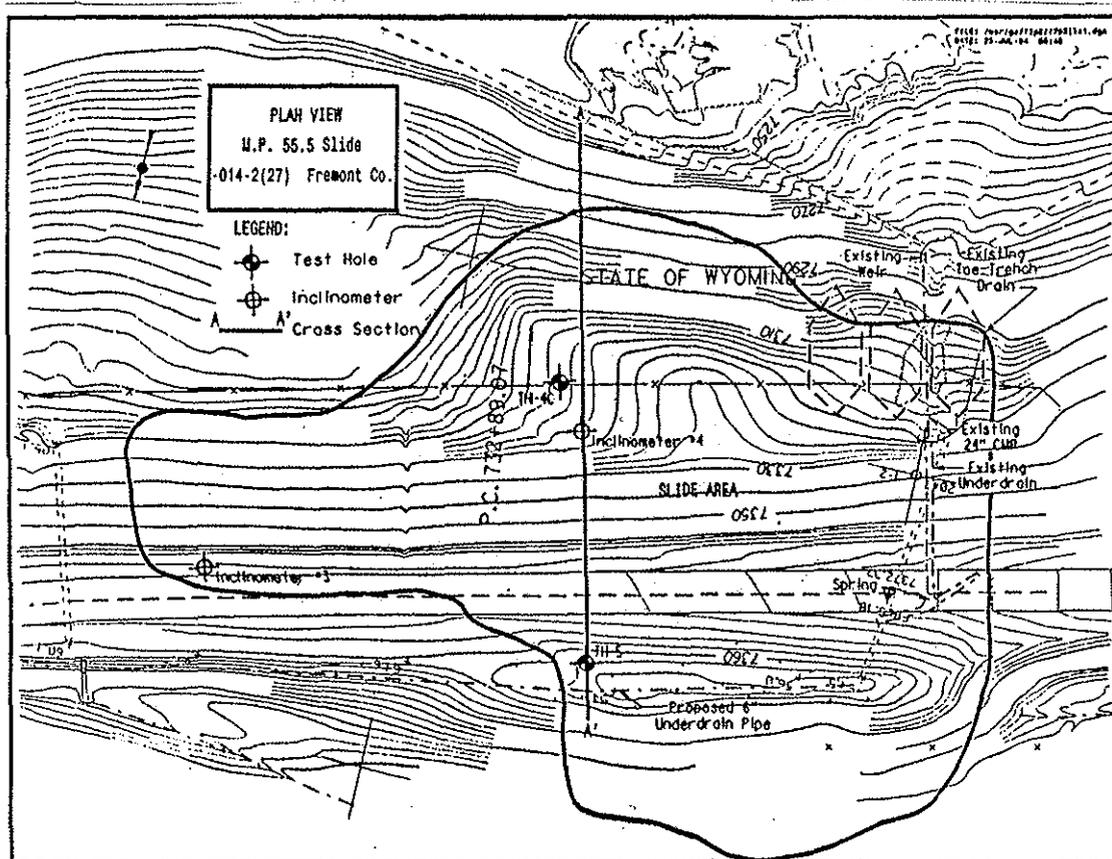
Plan view showing outline of slide area (Dahill, 1994)
